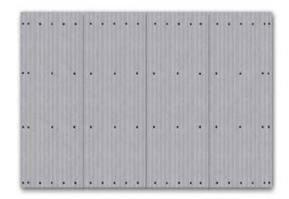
How to fix nails to binding tiles or corrugated sheets. For tile-tile connection, nails are fixed every 40 cm and for tile-structure connection, every 2 curves. For tiles on both ends of the roof, 2 nails are fixed on the first curves.
